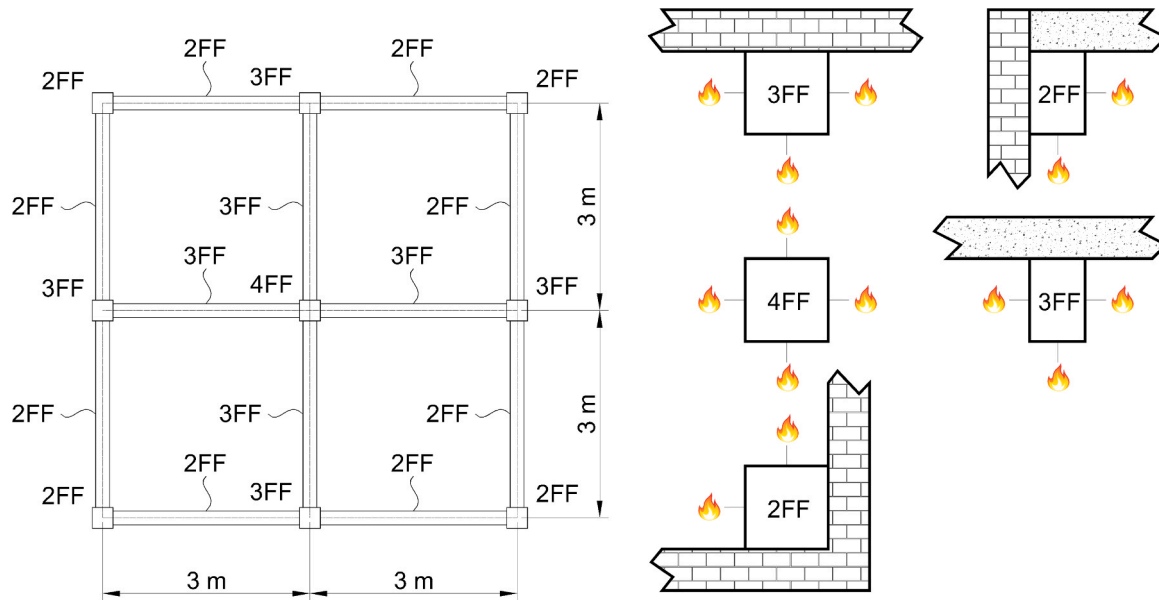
Plan view of the 3D structure and the number of fire sides (#FF) of beams and columns.
